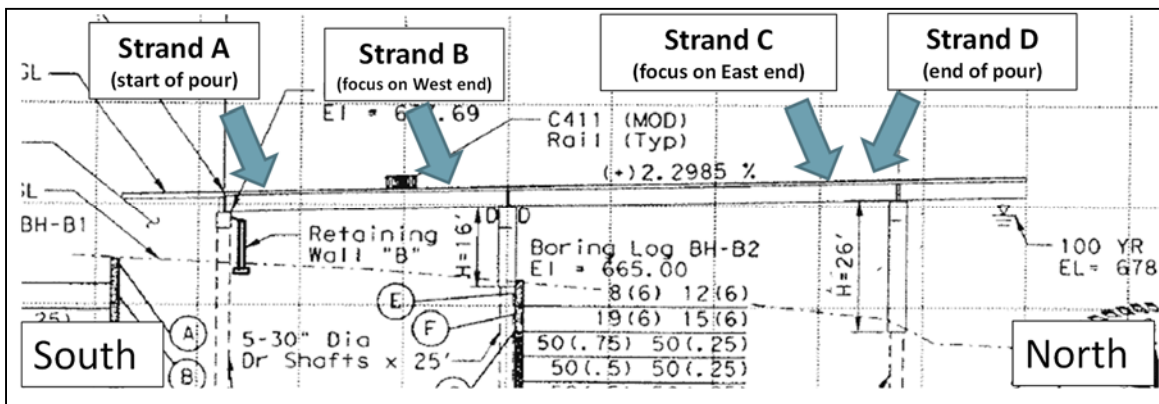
iButton strand layout for Georgetown bridge deck summer pour.
